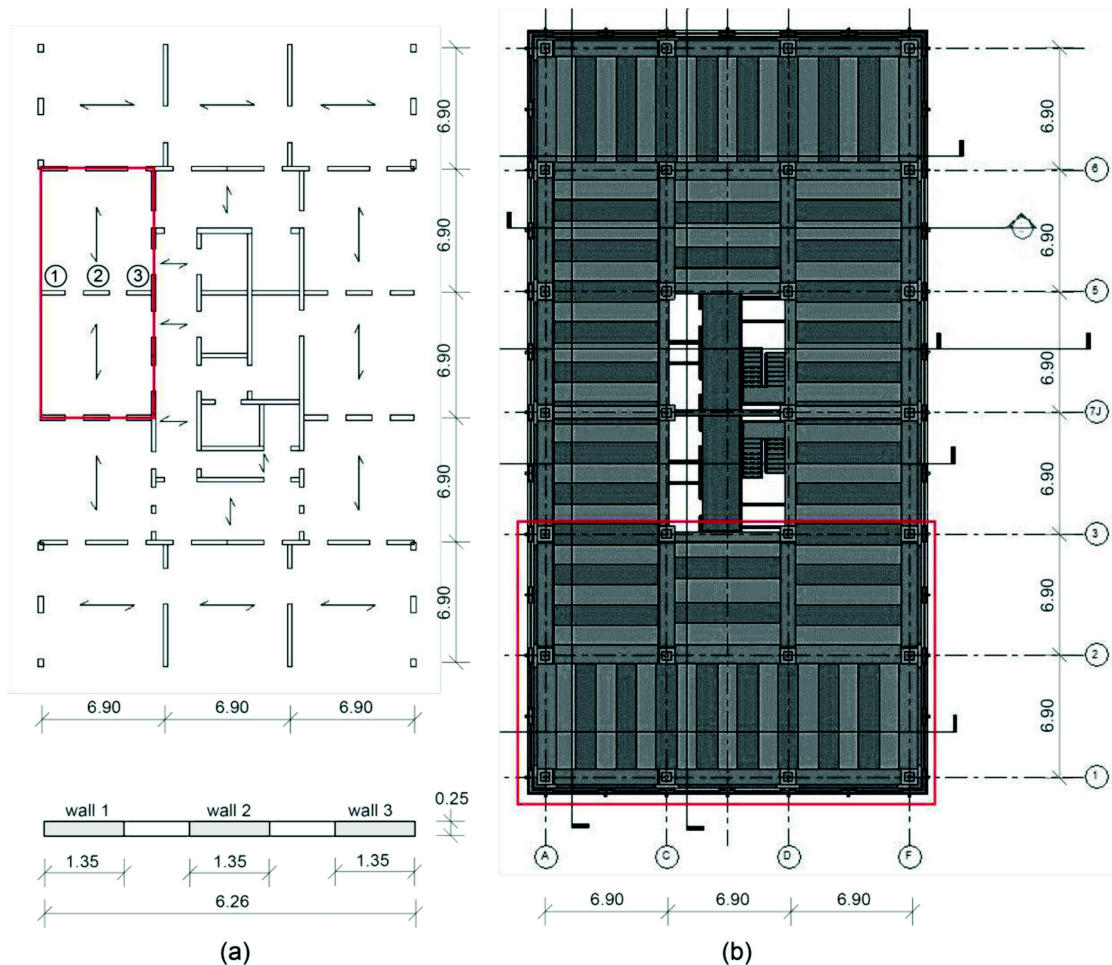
| Plant area modeled and analyzed for (a) wall system and (b) coupled wall-frame (unit: m).
